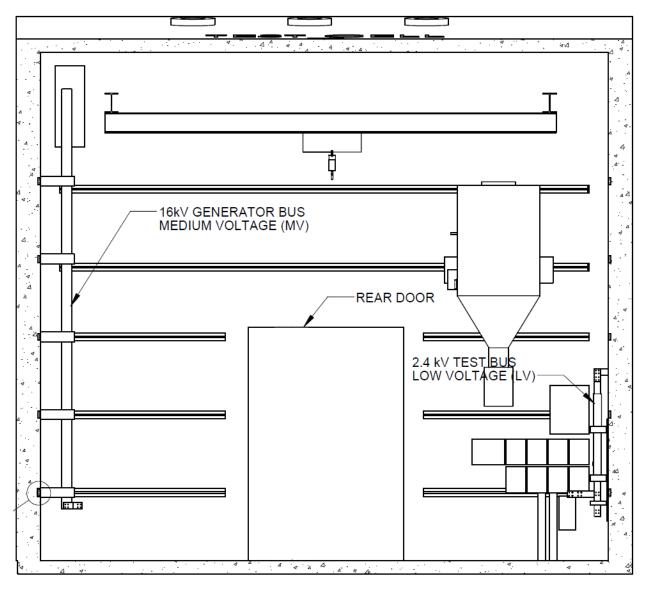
Elevation view of Test Cell #7. Low-voltage power connections located on right side of drawing.
